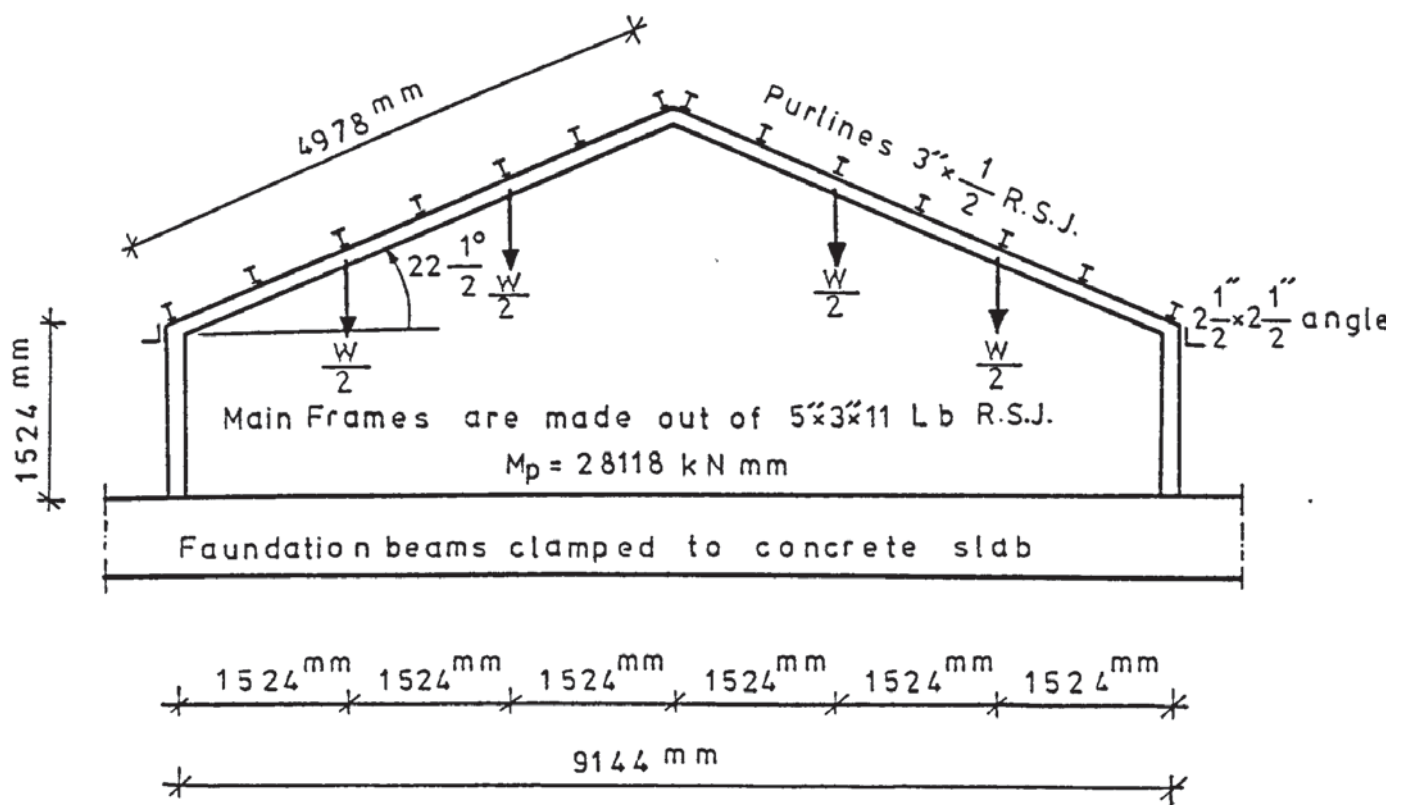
PITCHED ROOF STRUCTURE AND LOADING
